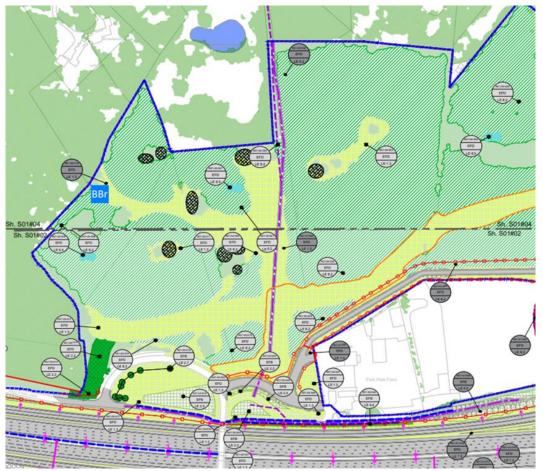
showing ancient woodland compensation planting as proposed in the Environmental masterplan, Section 1, Sheets 2 and 4, <u>link</u>
